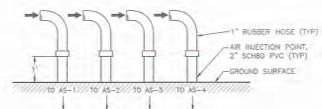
AIR SPARGE WELLS TYPICAL CROSS-SECTION
